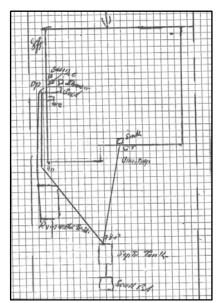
Original Drainage Plan (Source: KCDC Building File)
